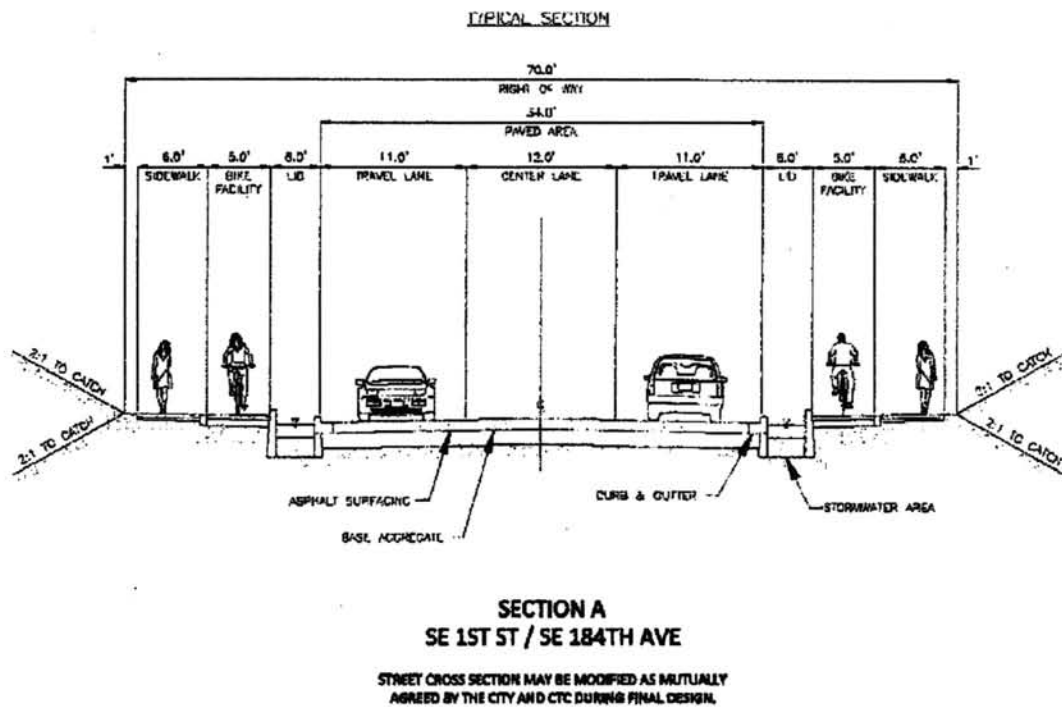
EXHIBIT E S.E. 184TH STREET ALIGNMENT
